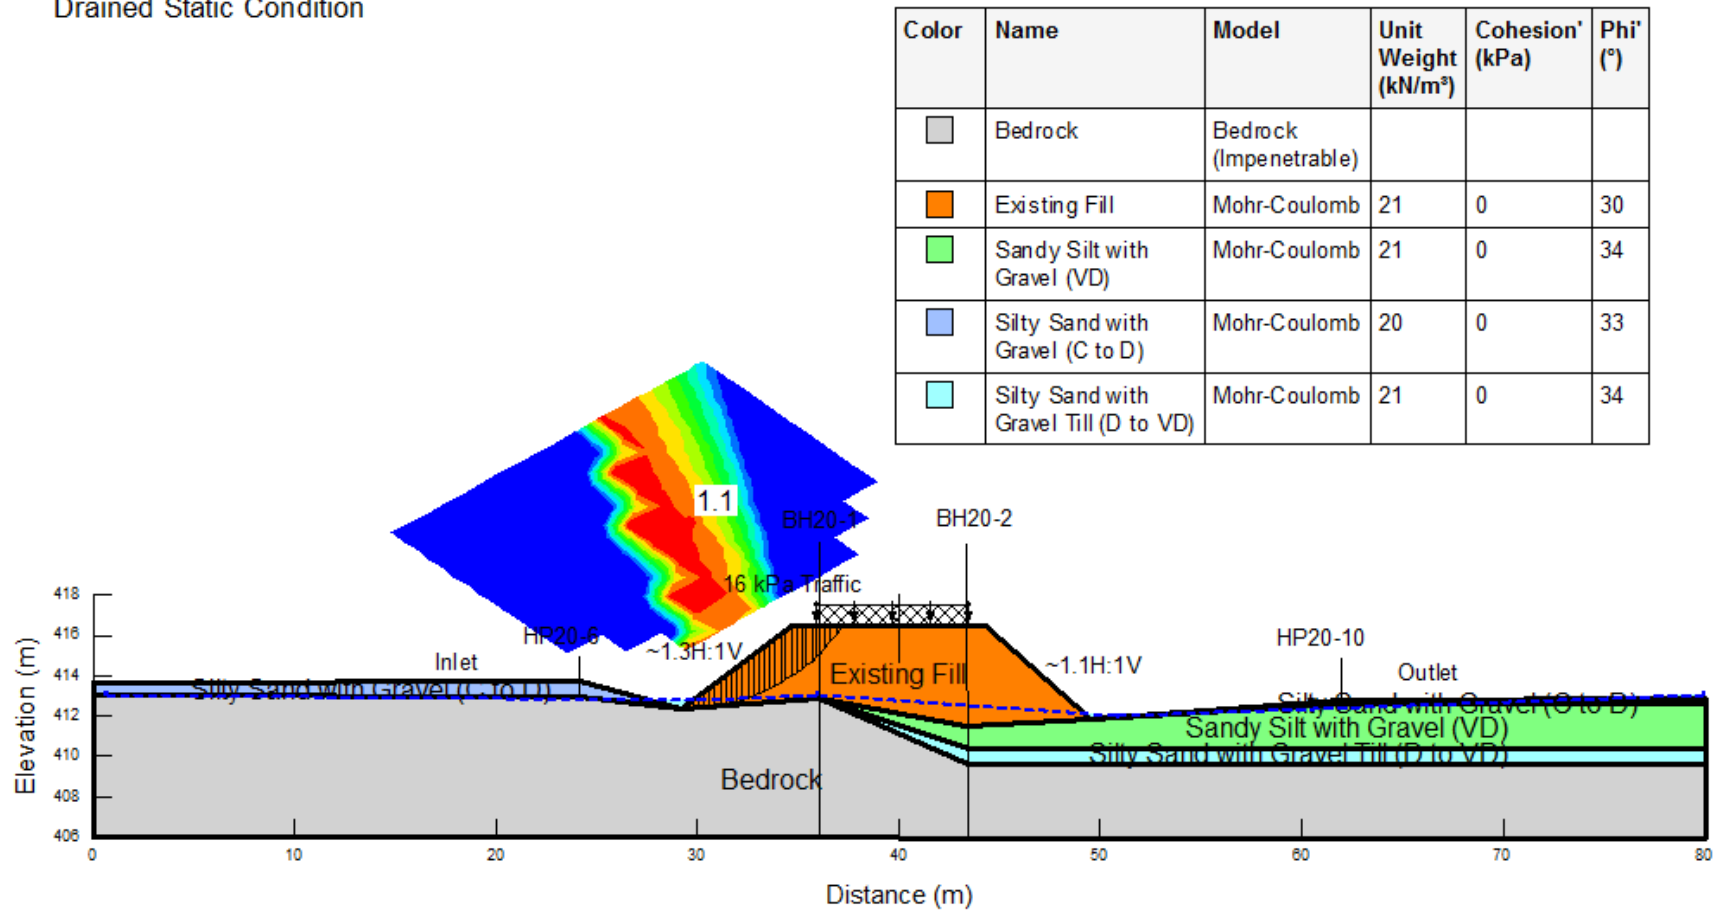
Slope stability analysis for existing north side of embankment (1.3H:1V) – drained static condition
